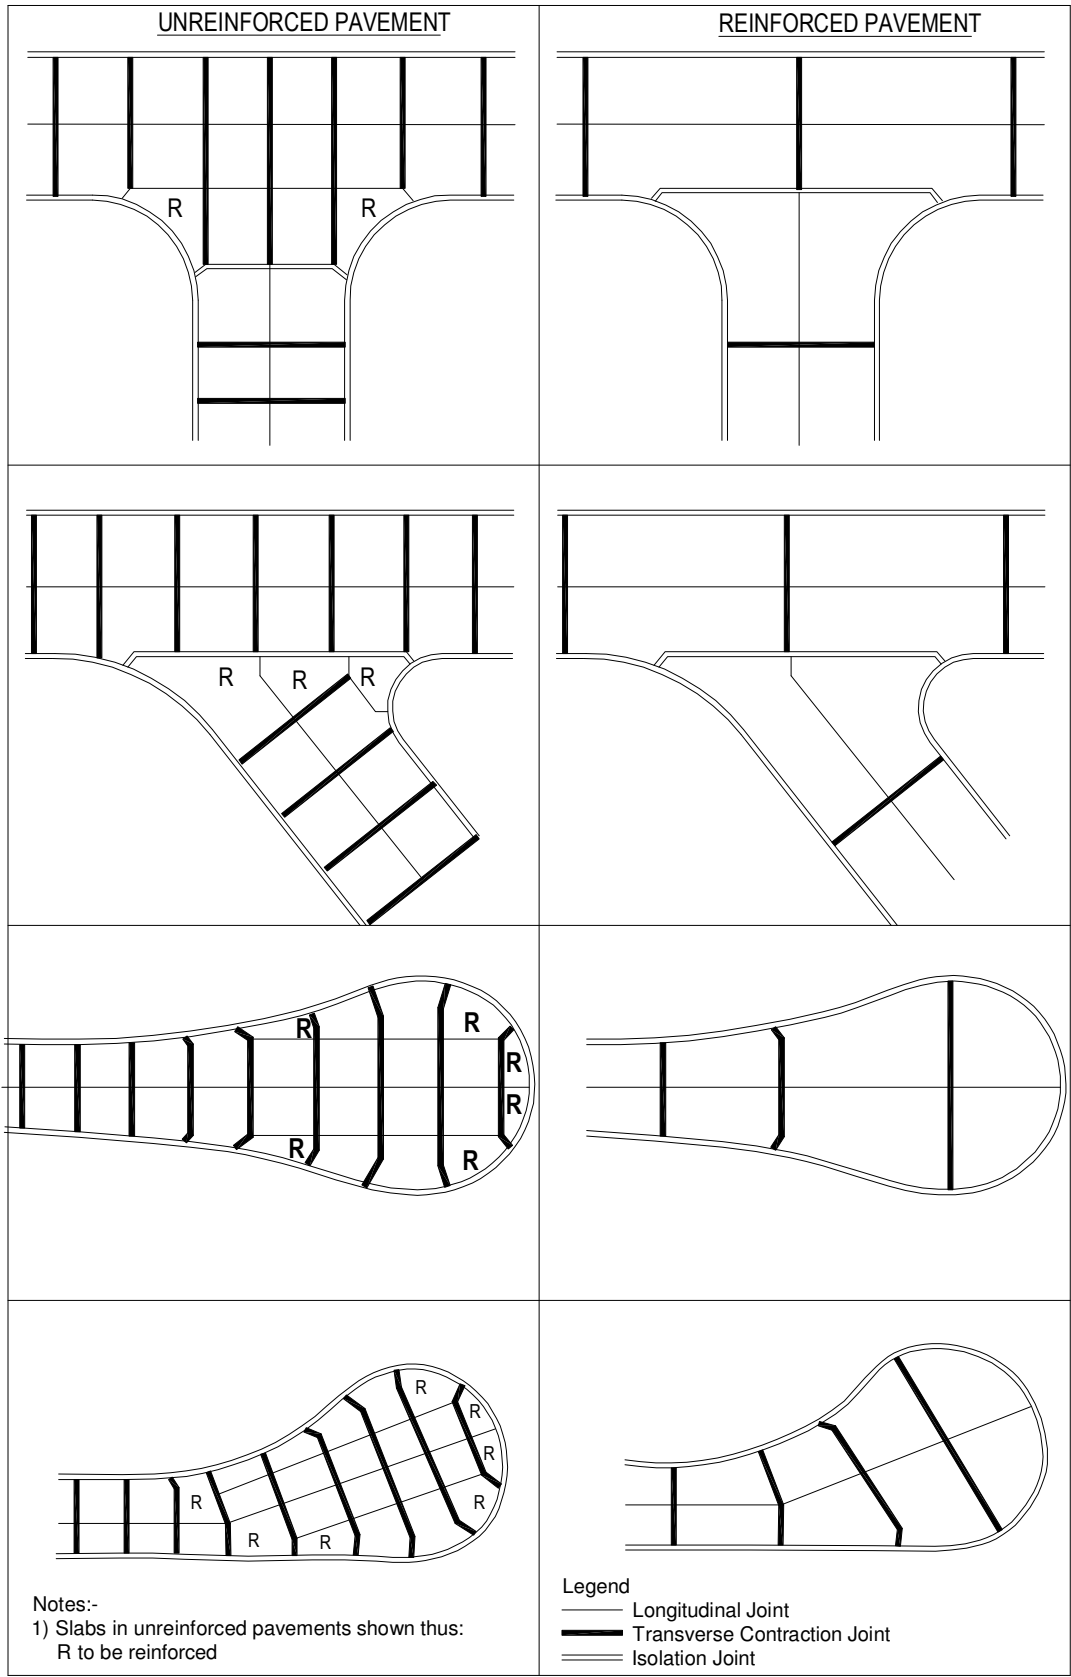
(B) Schematic Joint Layouts at Intersections and Cul-de-sacs
